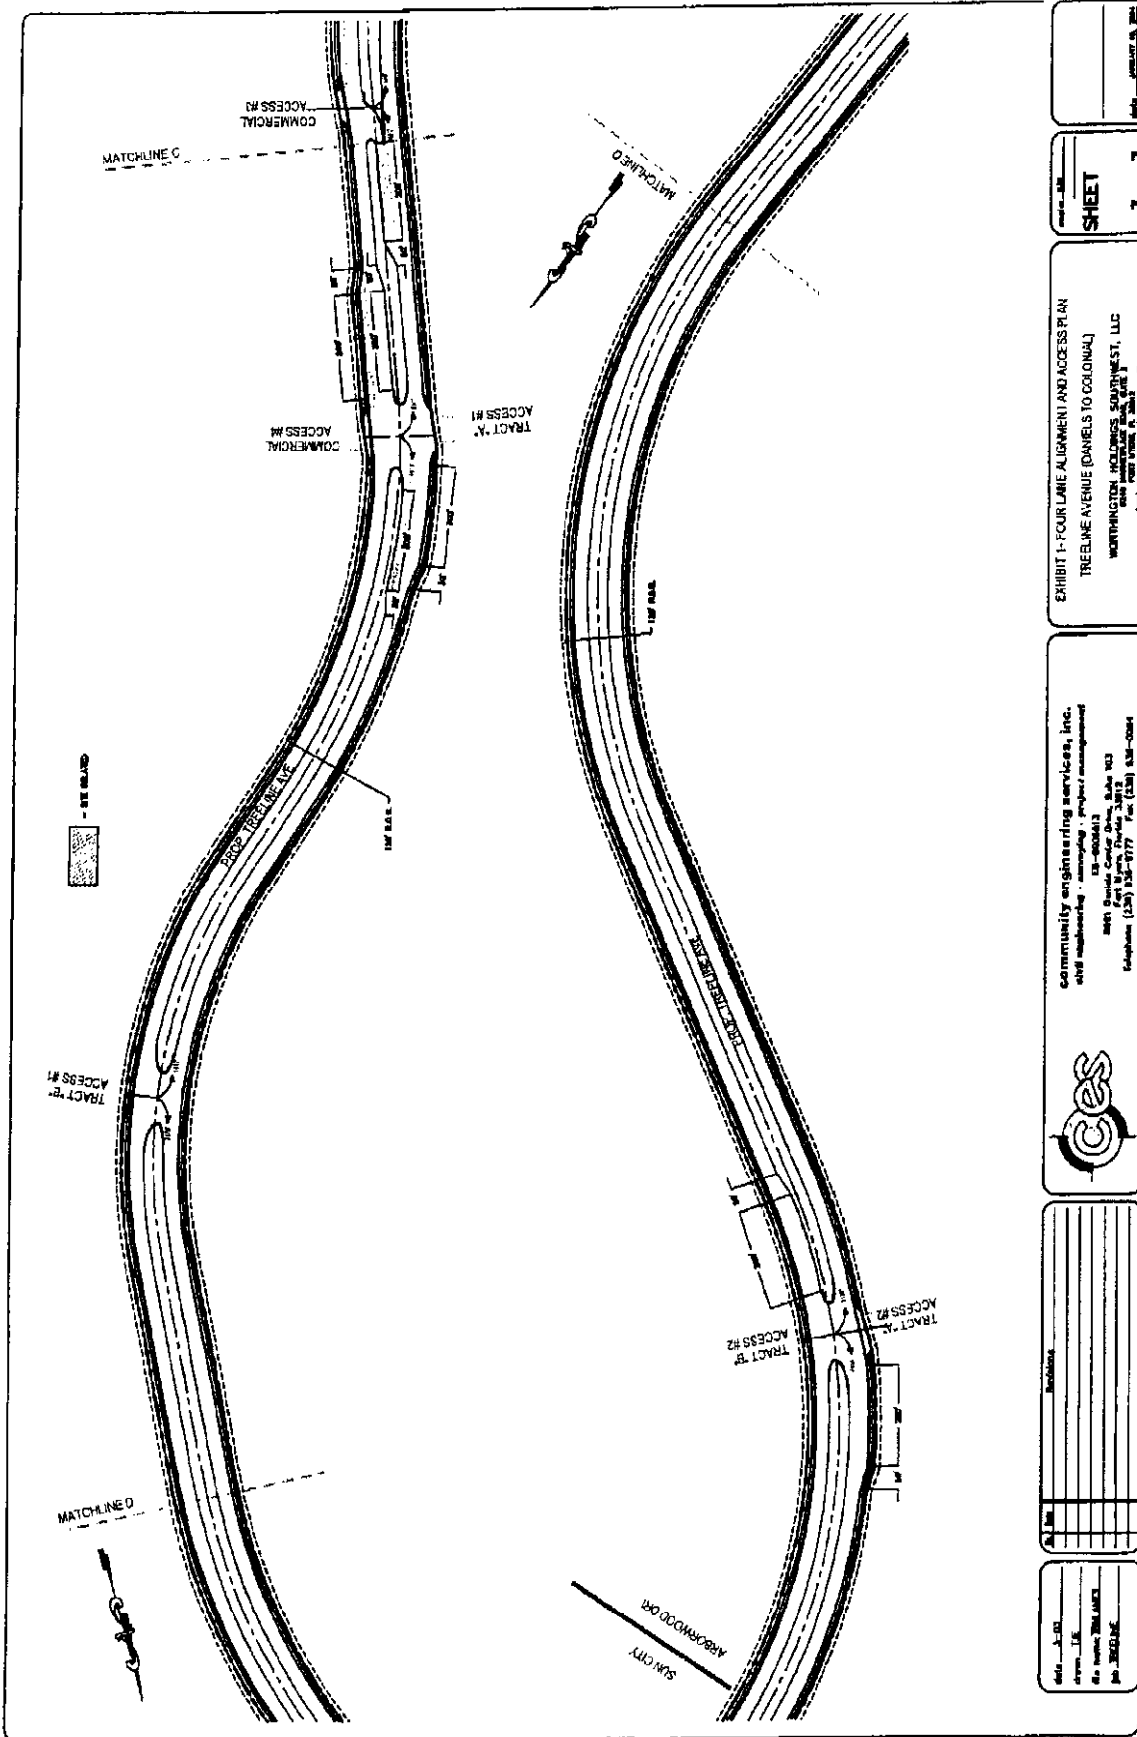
FOUR LANE ALIGNMENT AND ACCESS PLAN
